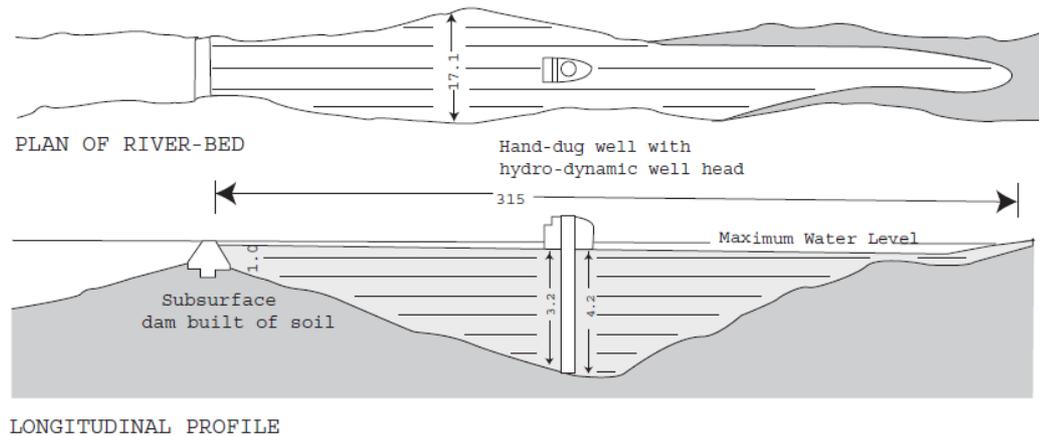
Example of longitudinal profile and plan view of sand reservoir.
